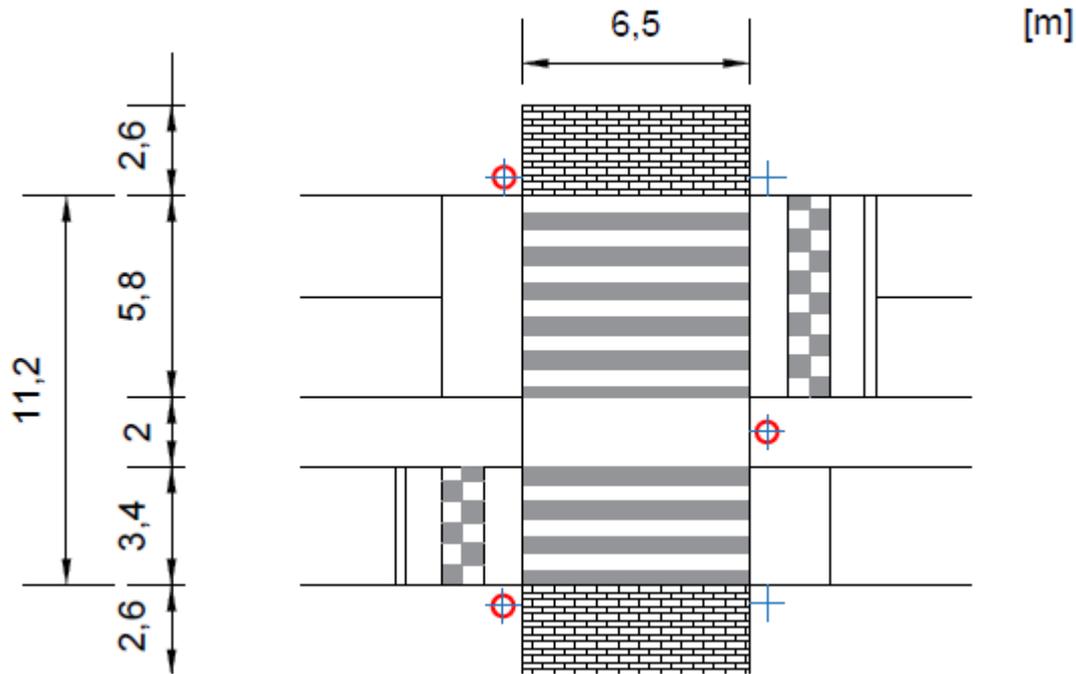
Measured geometric dimensions and layout of the crosswalk.
